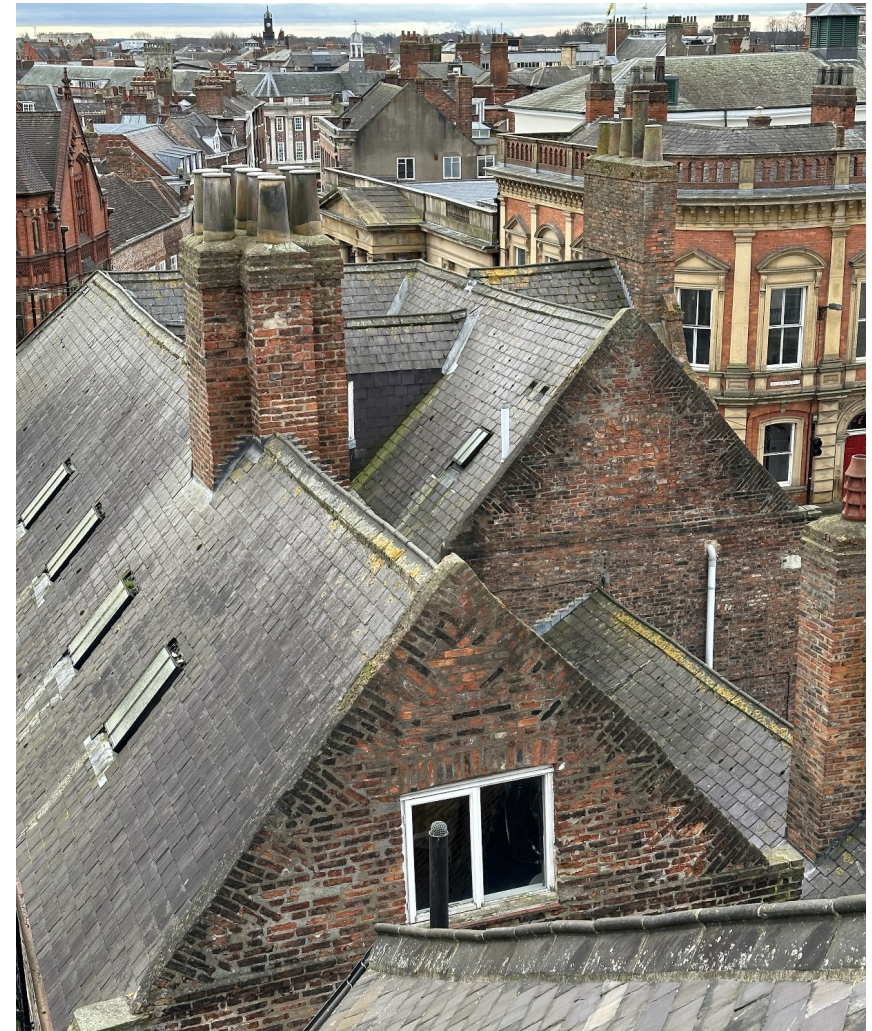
Roofscape of the site viewed from the north, showing 5no. rooflights (1.05), and in the left gable end, the casement window proposed for replacement (1.15).
